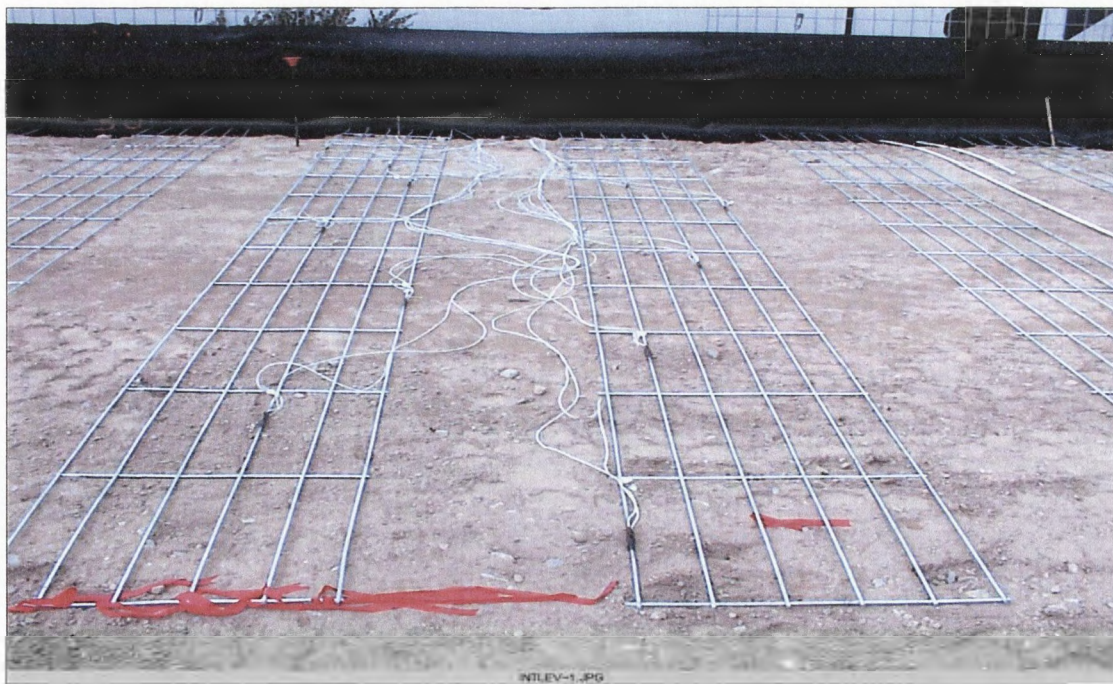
Photograph showing an instrumented bar mat during construction
